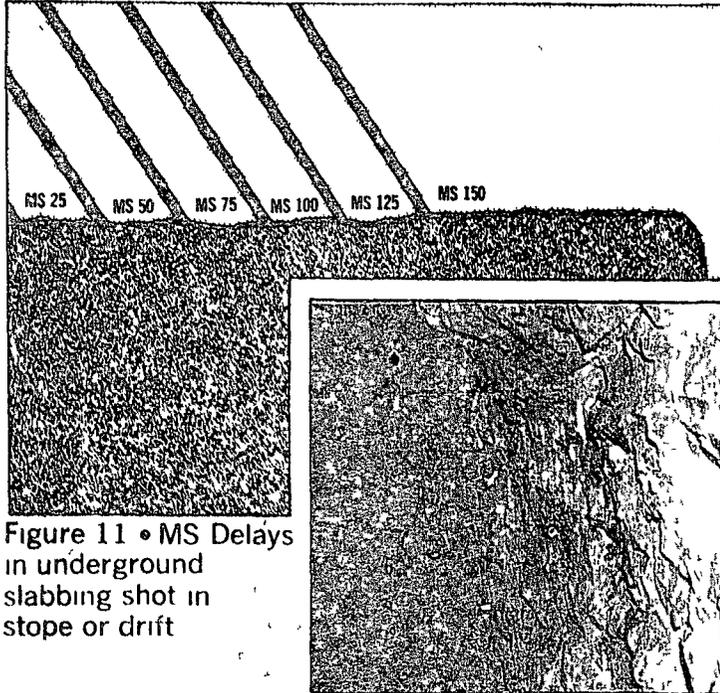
• MS Delays in underground slabbing shot in stope or drift
